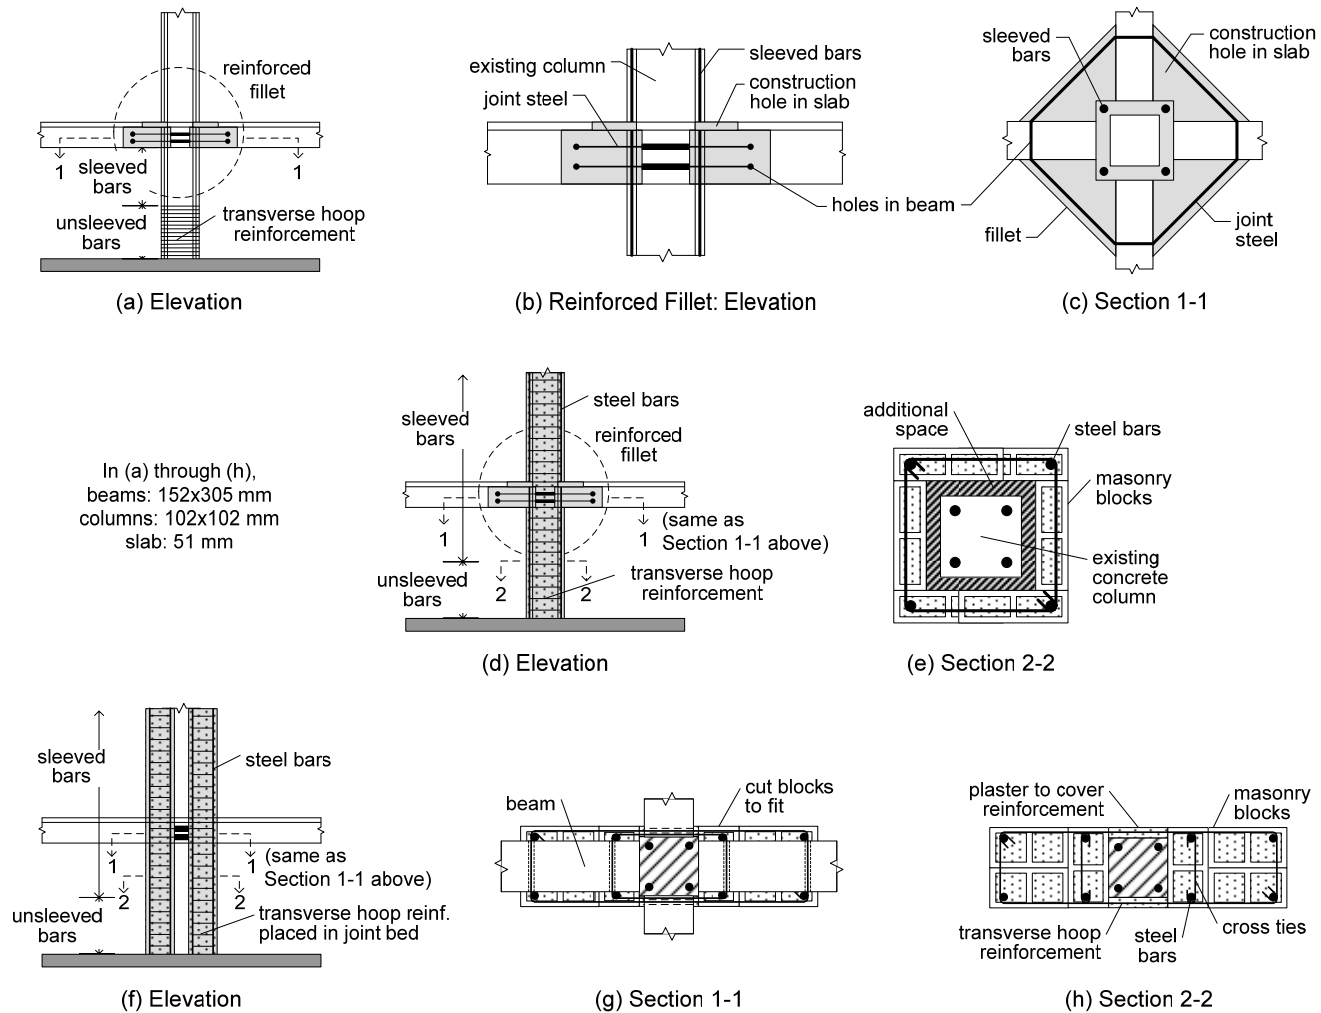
Retrofit techniques studied by Bracci et al. [2.14]: (a, b, and c) prestressed concrete jacketing; (d and e) masonry block jacketing; and (f, g, and h) partial masonry infill.
